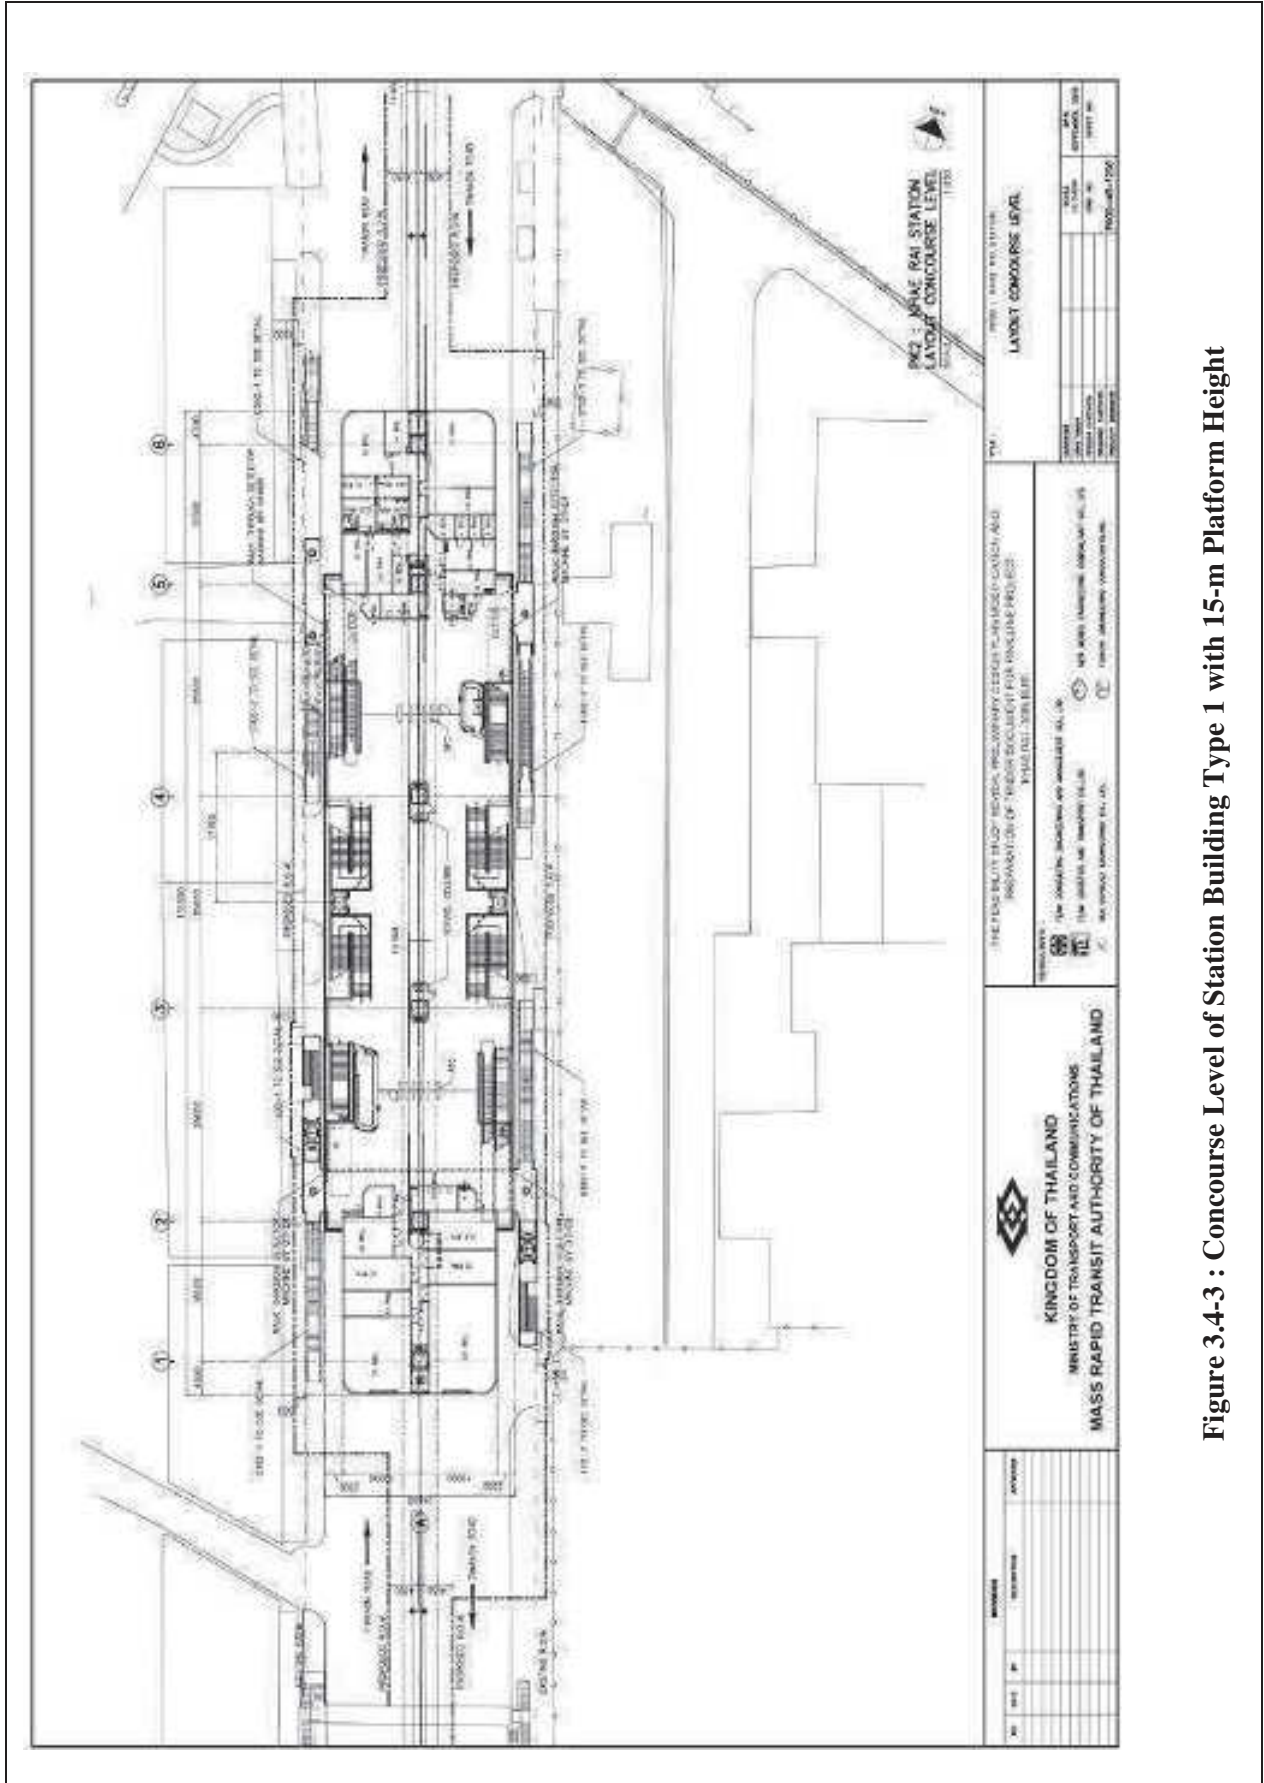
Concourse Level of Station Building Type 1 with 15-m Platform Height
